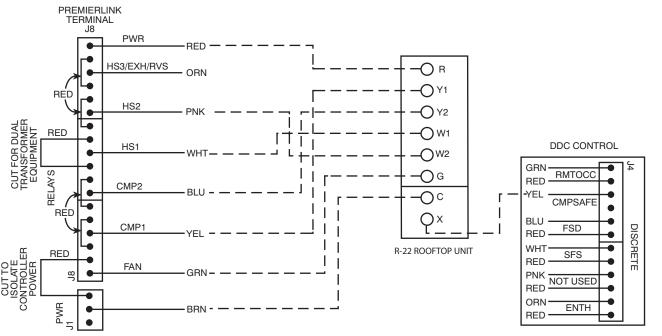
Typical PremierLink Control Wiring To Rooftop R-22 Units
